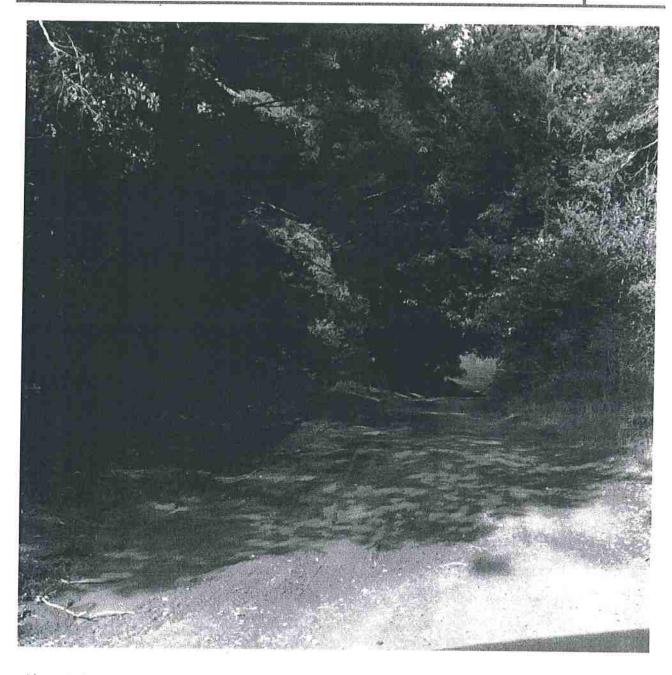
Inadequate water drainage features on road. Photo date 11-11-16
